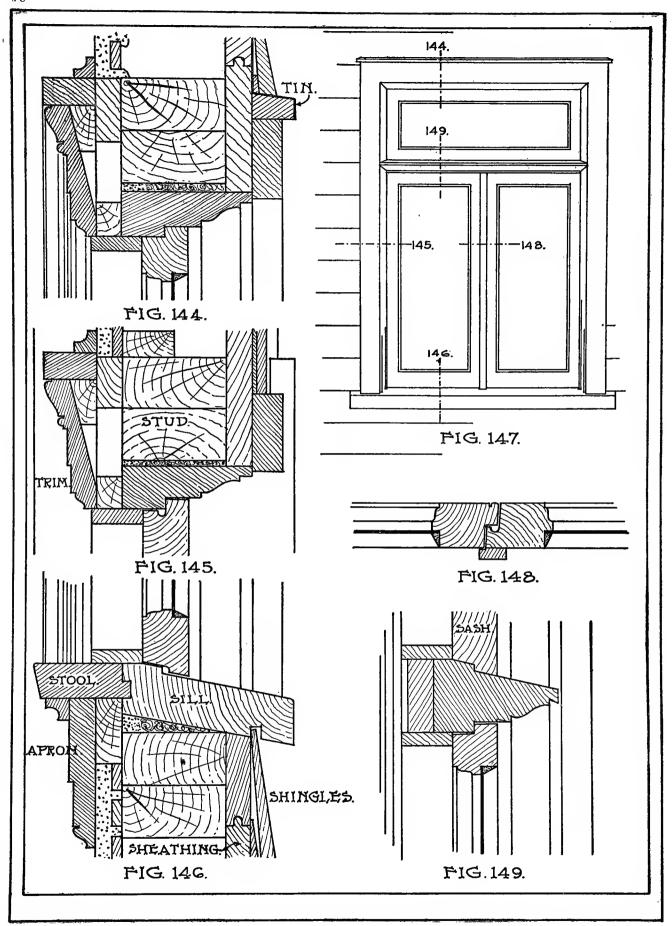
DOUBLE CASEMENT WINDOWS WITH STATIONARY TRANSOM
